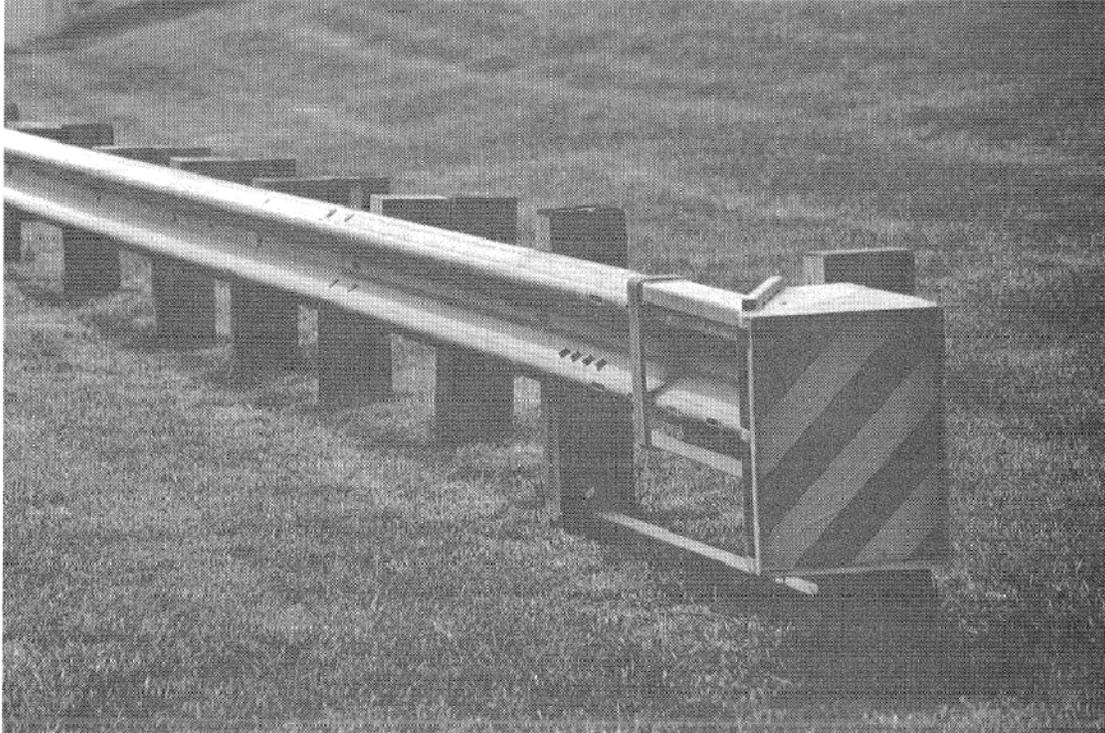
Vermont low-speed, W-beam guardrail end terminal (AASHTO 2002).
